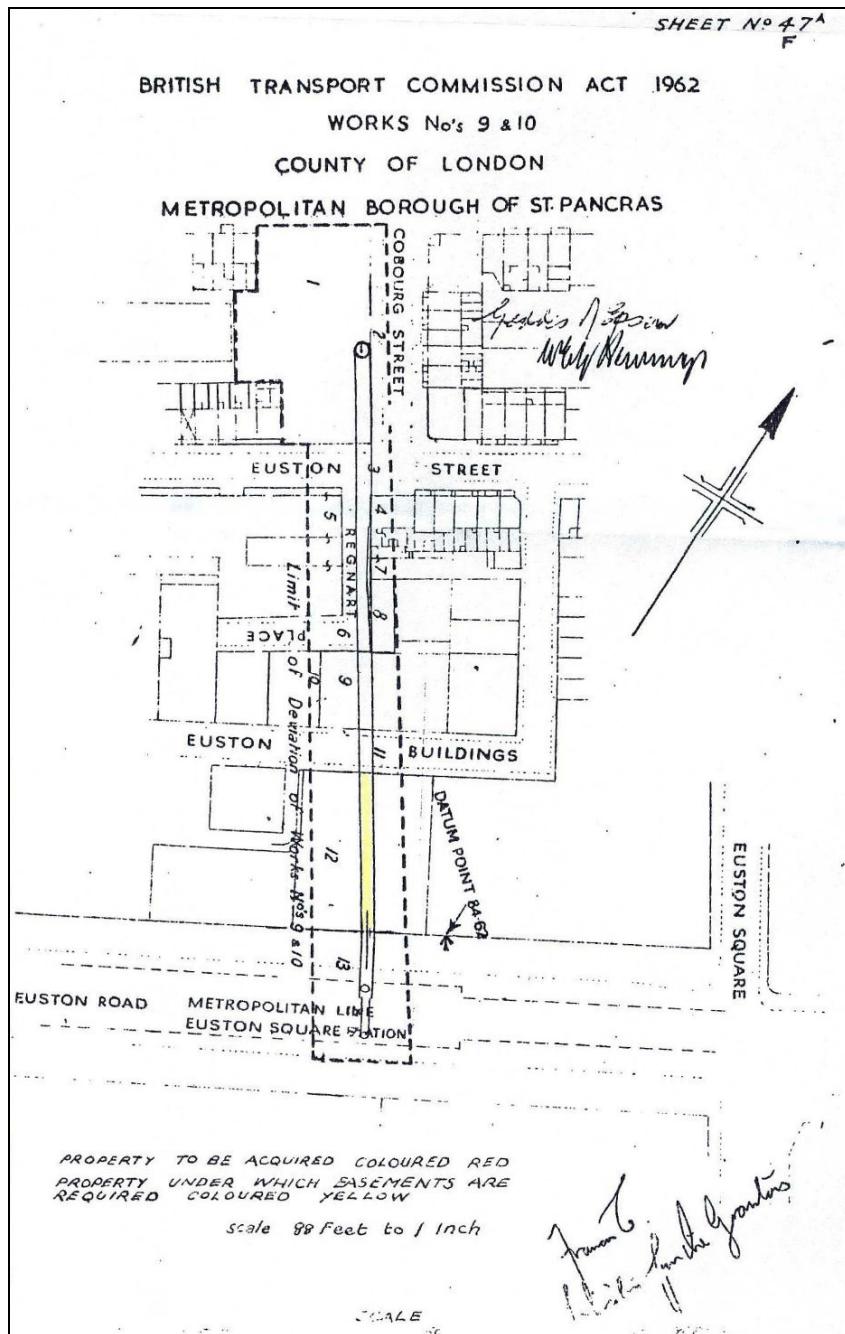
Detailed plan of cable duct beneath Bentley House, prior to construction (London Underground Ltd, not to scale)
